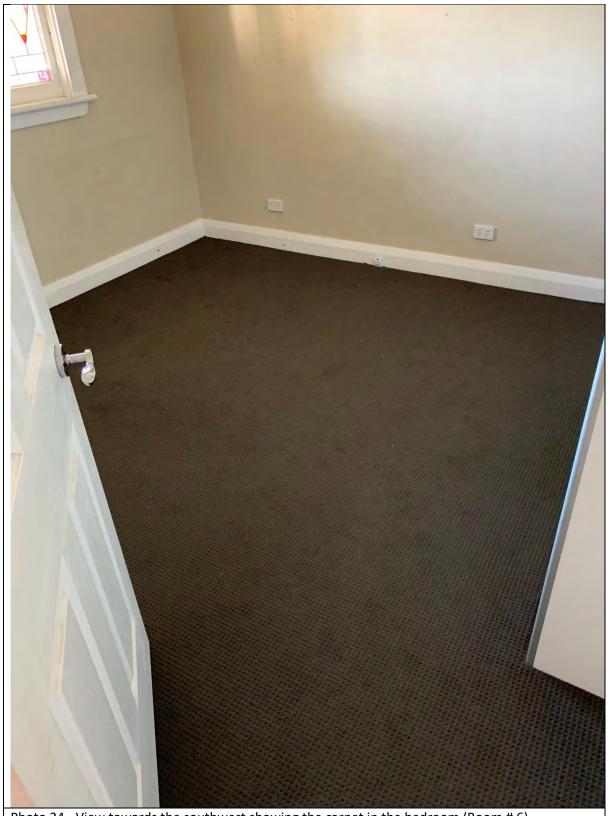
View towards the southwest showing the carpet in the bedroom (Room # 6).
